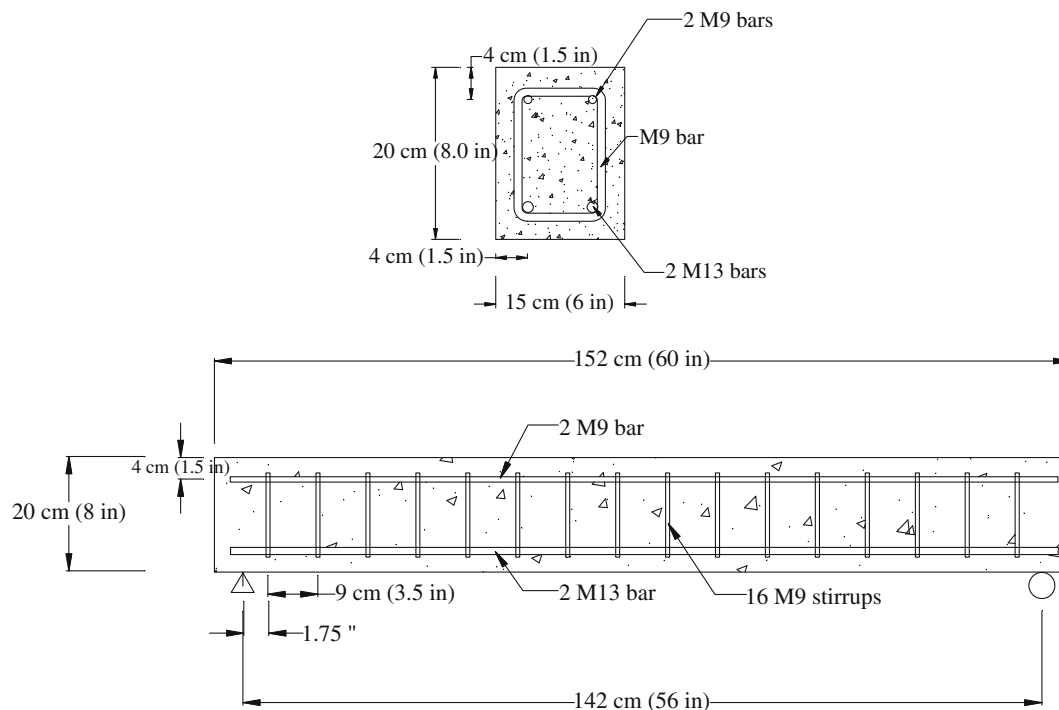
(a) Cross-section of RC beam, and (b) reinforcement layout of RC beam.
